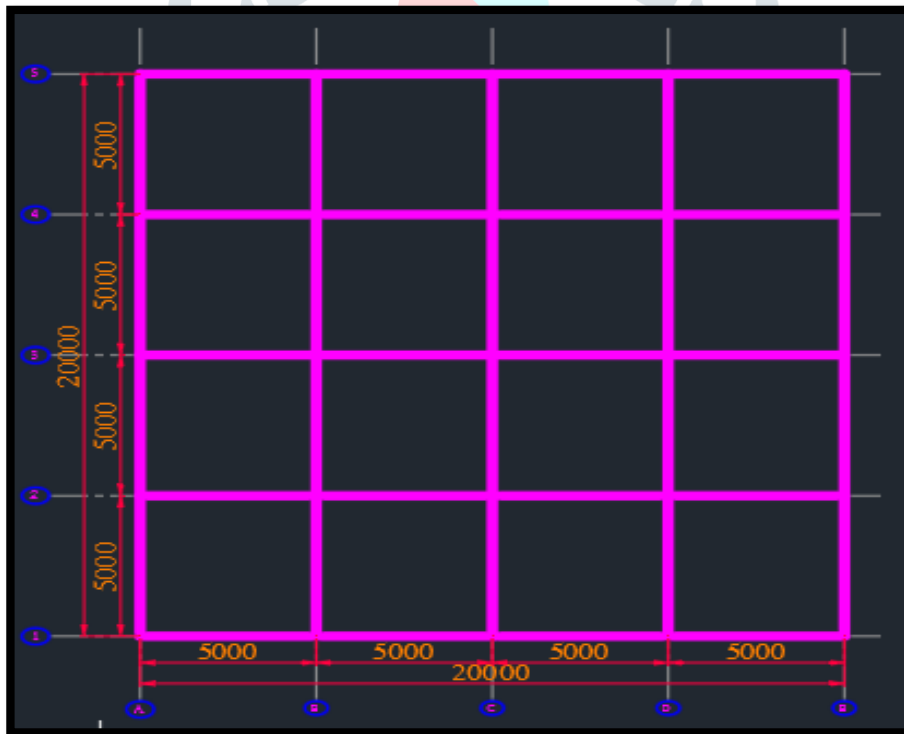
Column Beam Layout for Analysis for Plan B with B1, B2, B3, B4 Model
